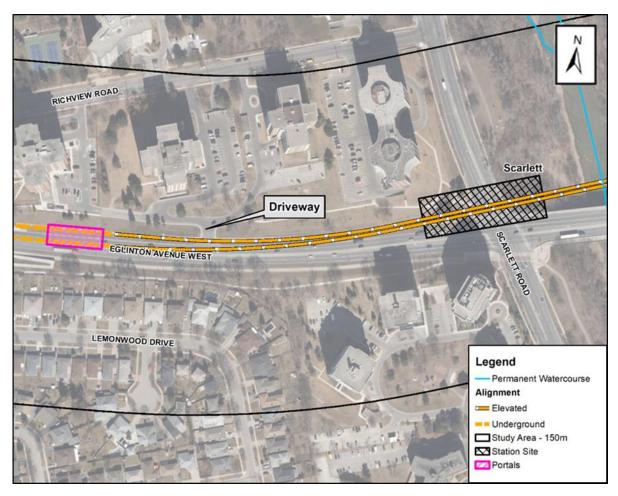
Tunnel Portal to West of Scarlett Road & Adjacent Driveway
